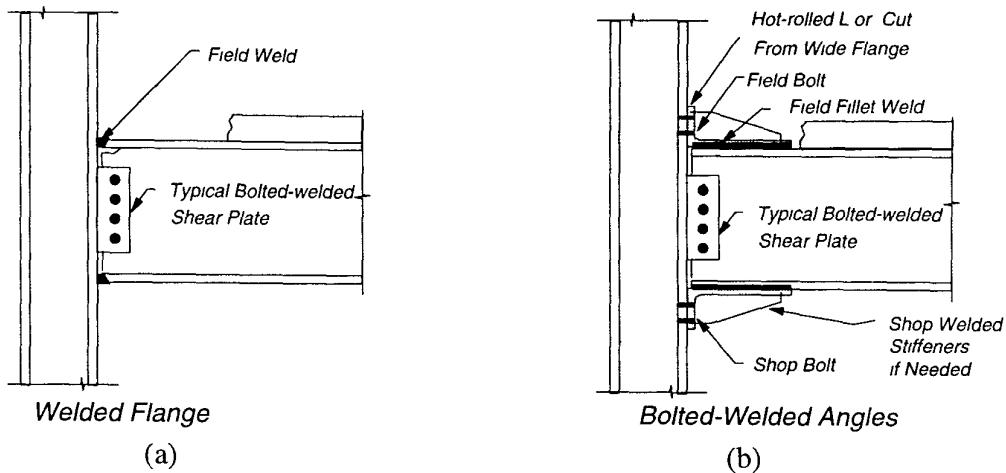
Examples of Field-Welded Steel Moment Frame Connections
